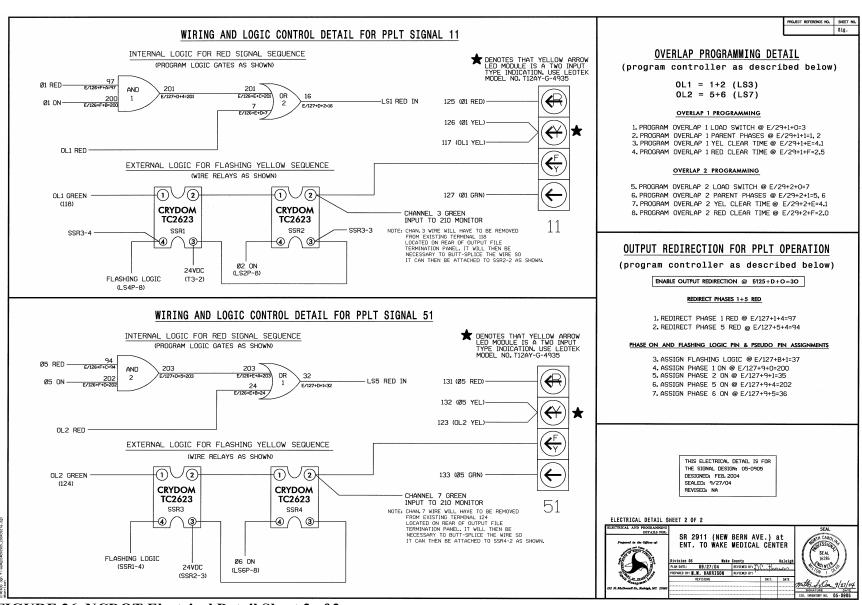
NCDOT Electrical Detail Sheet 2 of 2
